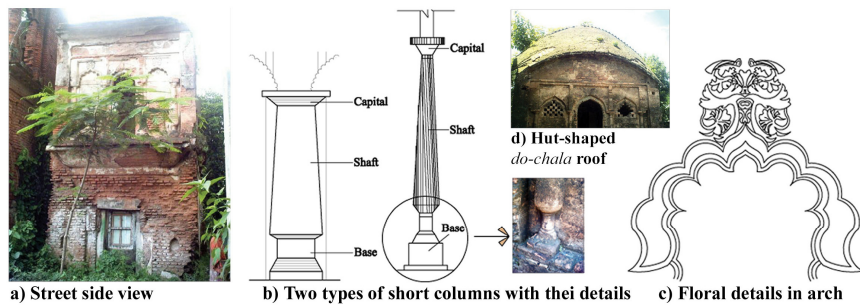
a) Street side view, b) Two types of short column, c) Floral details in arch, and d) Do-chala roof of the building no. - 42; (Source: Field Study, in 2006 and prepared by the author)
